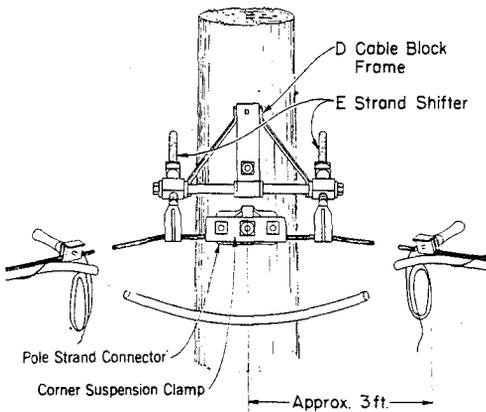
E Strand Shifter Installed on D Cable Block Frame
